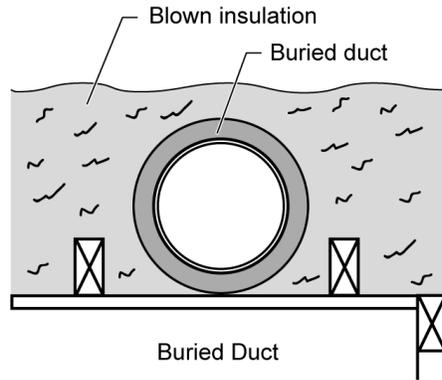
Example: Buried Ducts on Ceiling and Deeply Buried Ducts
